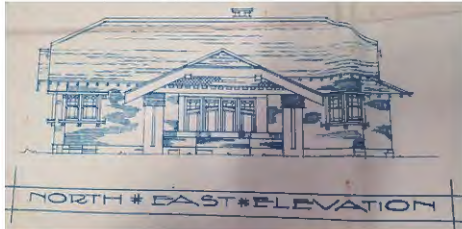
5A Vivian Street, Bellevue Hill North-East Elevation
